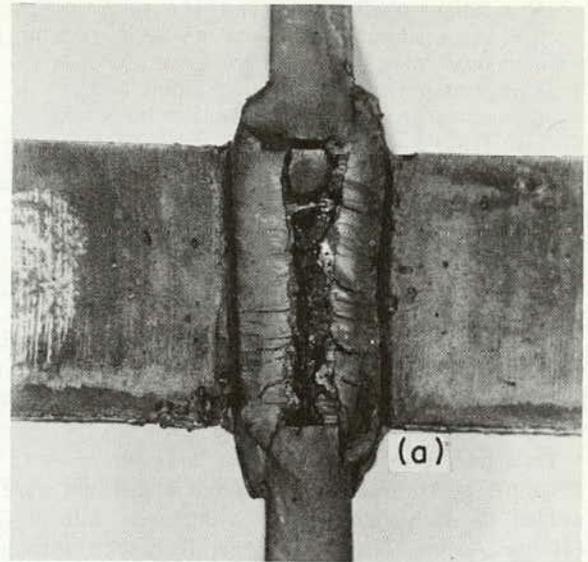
Cracked surface of flange: (a) framing into web detail; (b) penetrating web detail.
